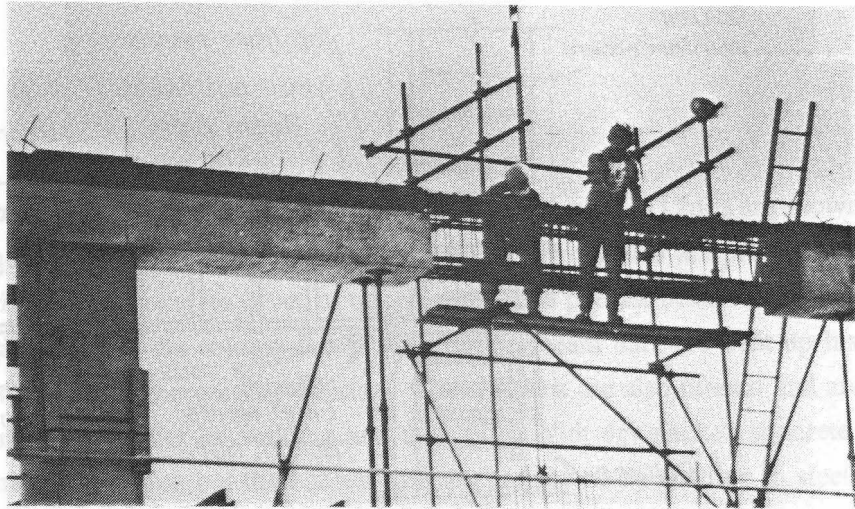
Straight Midspan Splice Between Precast Concrete Beams of System 3.
